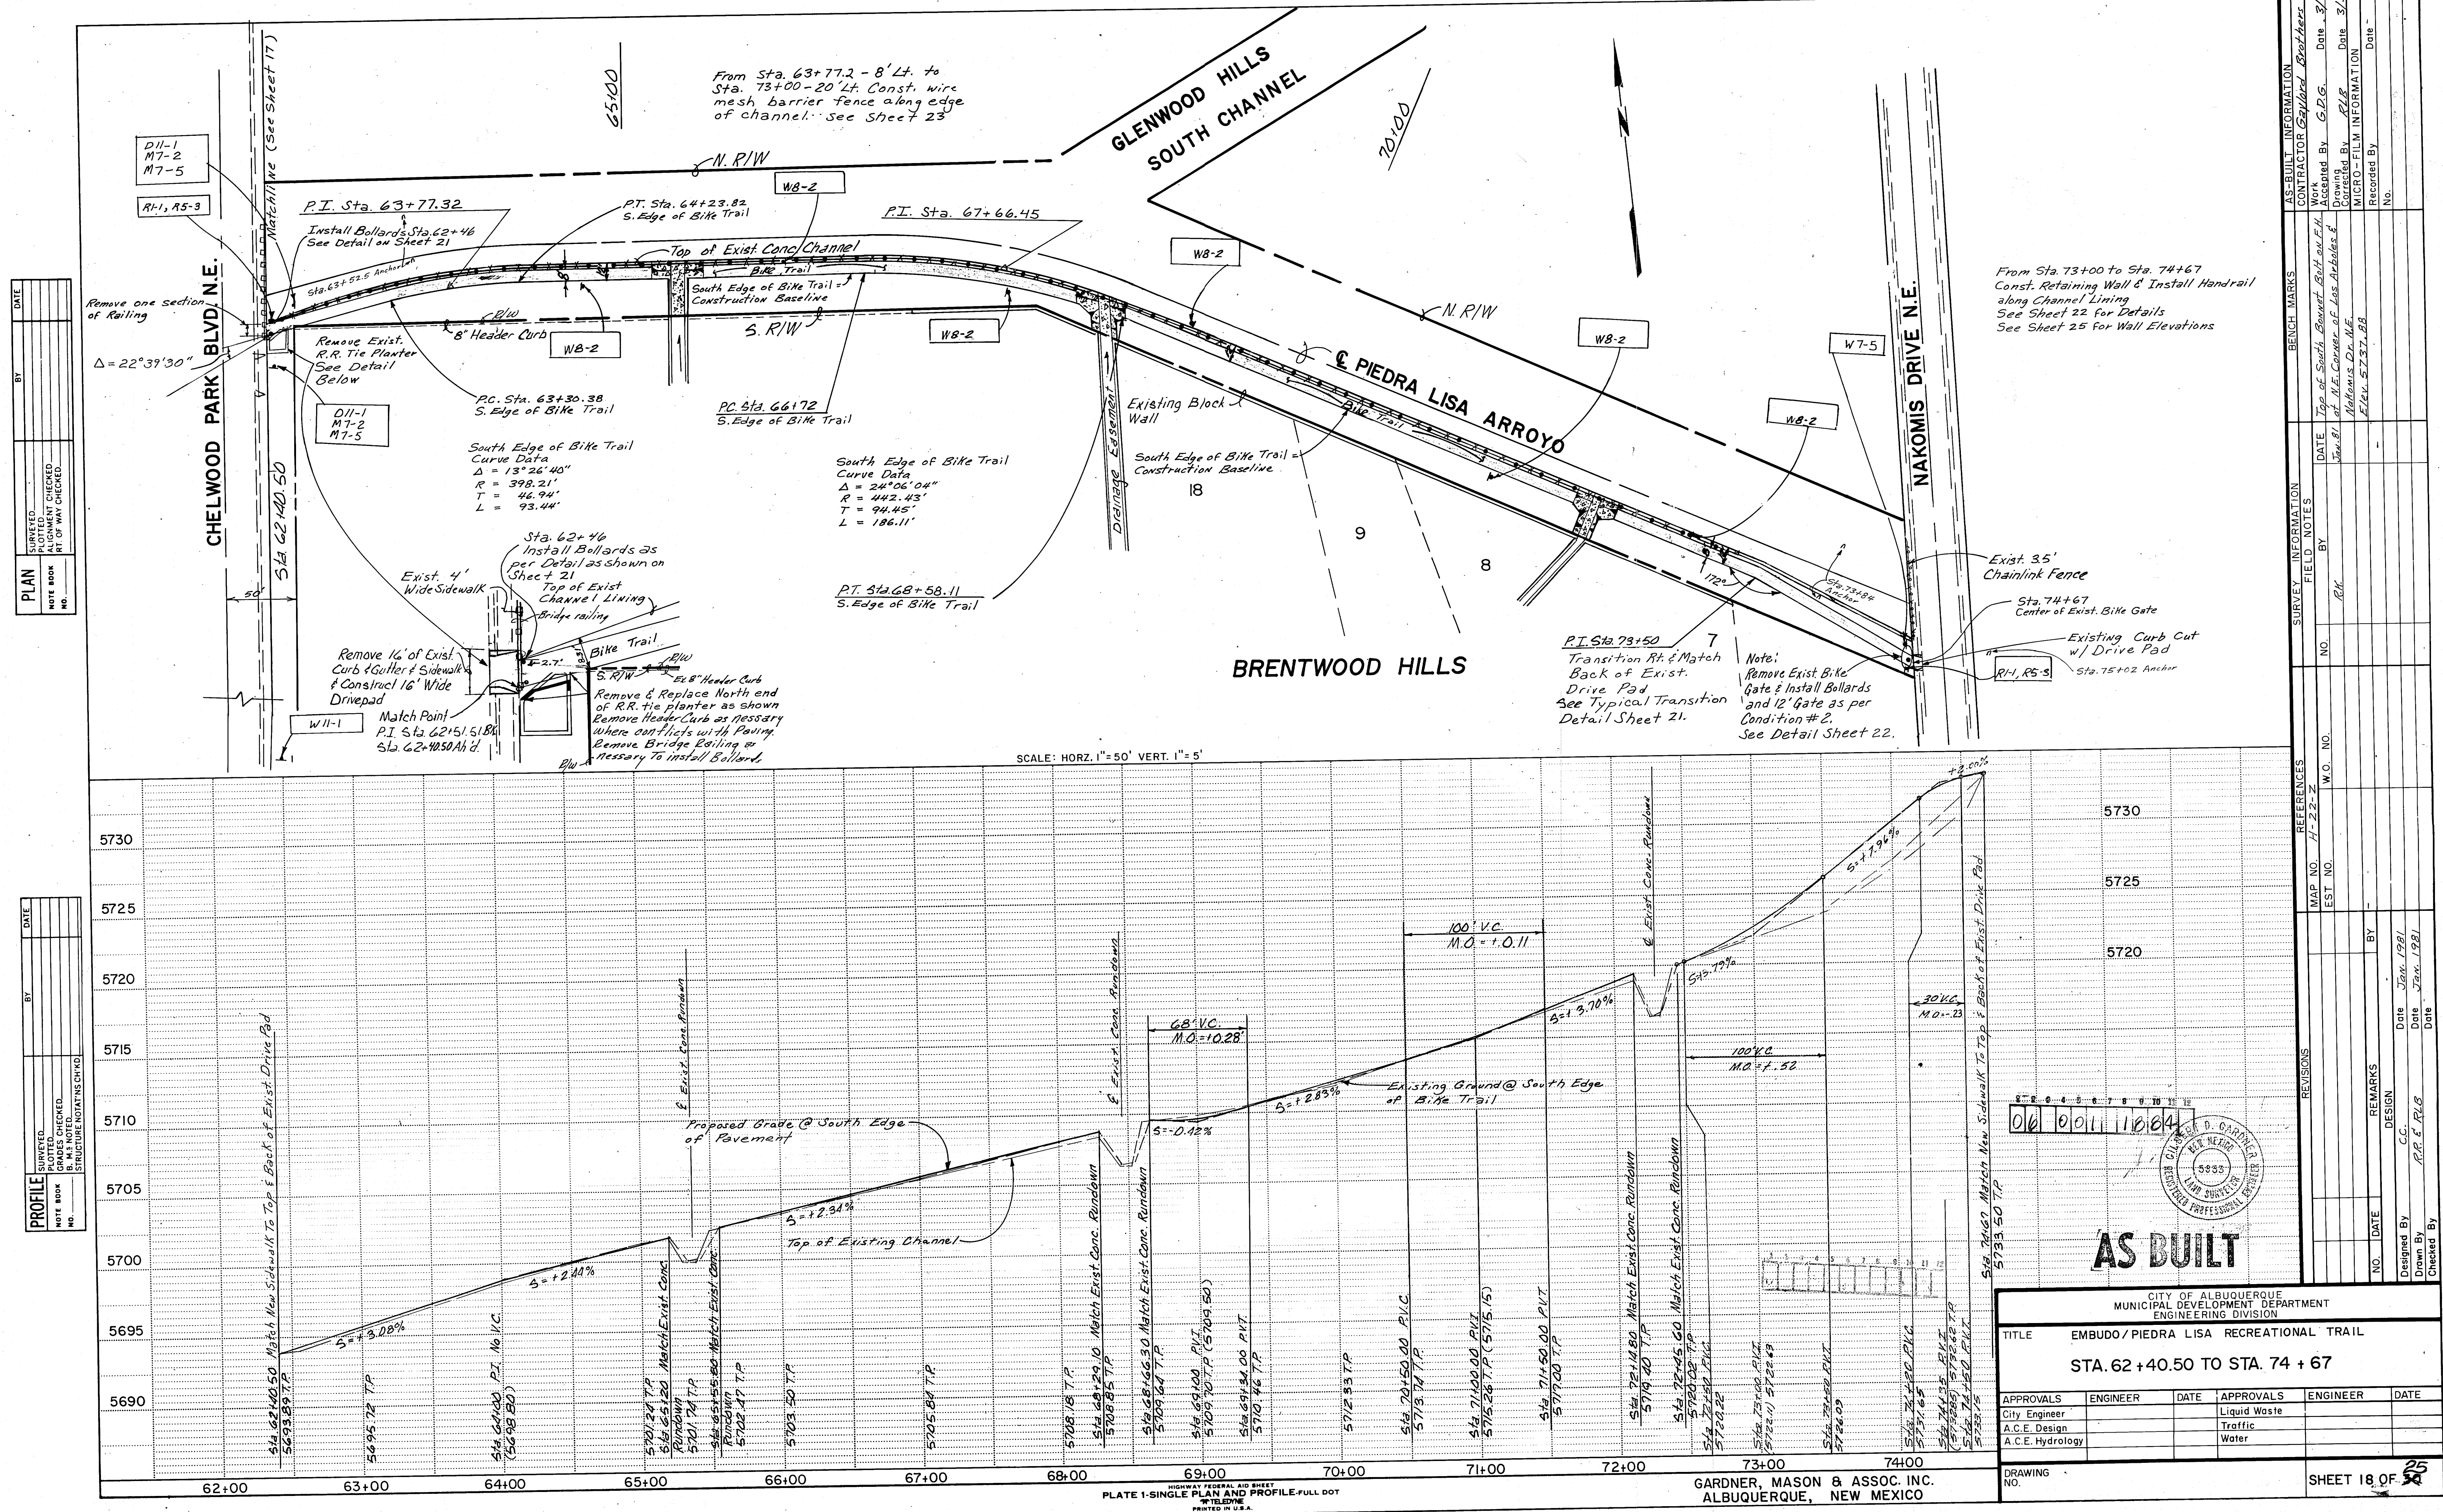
SINGLE PLAN AND PROFILE-FULL DOT
